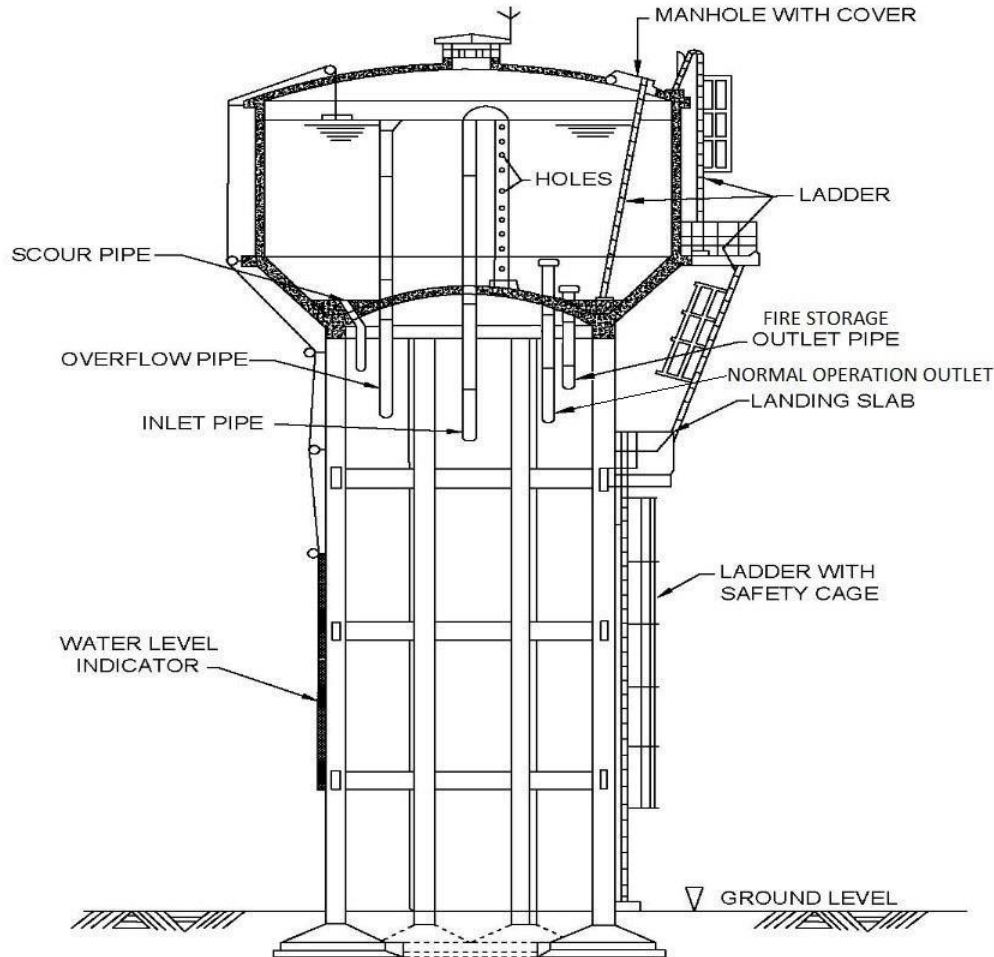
Typical Piping Arrangement in Elevated Service Reservoir
